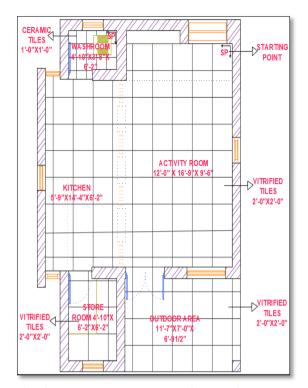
Proposed Floor Plan & Flooring Layout of Design Project-II Nandghar Kashipura
